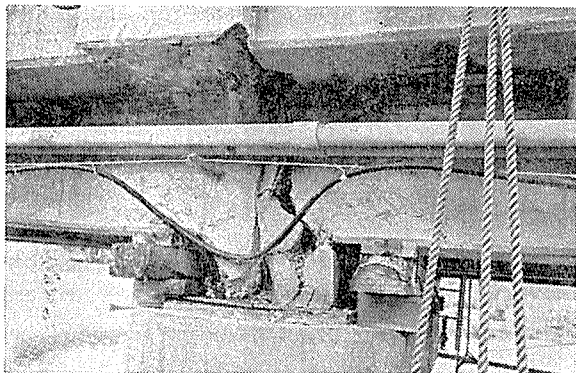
Anenuma railway viaducts (Reinforced concrete 3-span continuous rigid frame)
